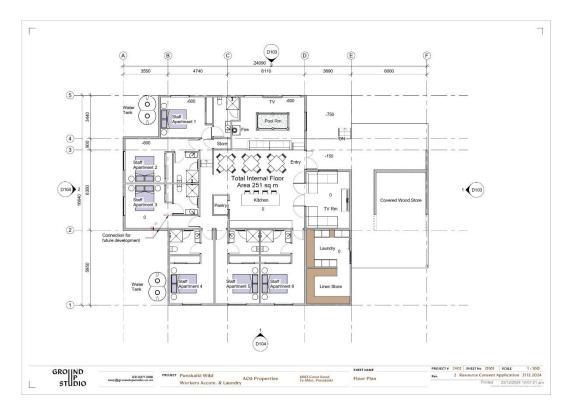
Worker Accommodation Building – Floor Plan (Ground Up Studio)
